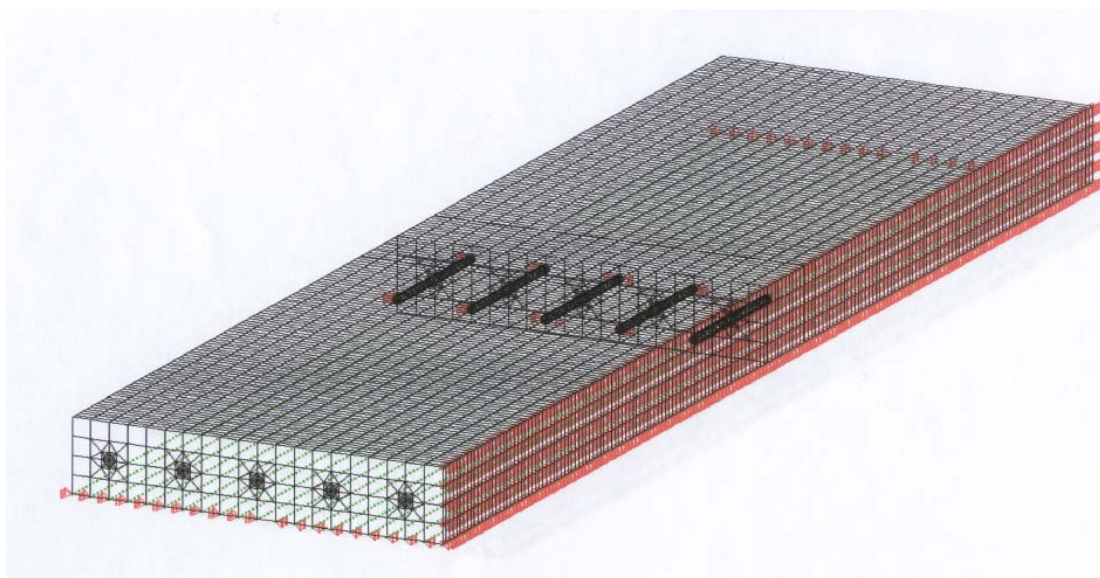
Implementing model beams into concrete slab sections; here: 10 dowels along a 2.5m wide transversal joint (symmetric model). Slab length 2.0m each (Steidl 2003).
